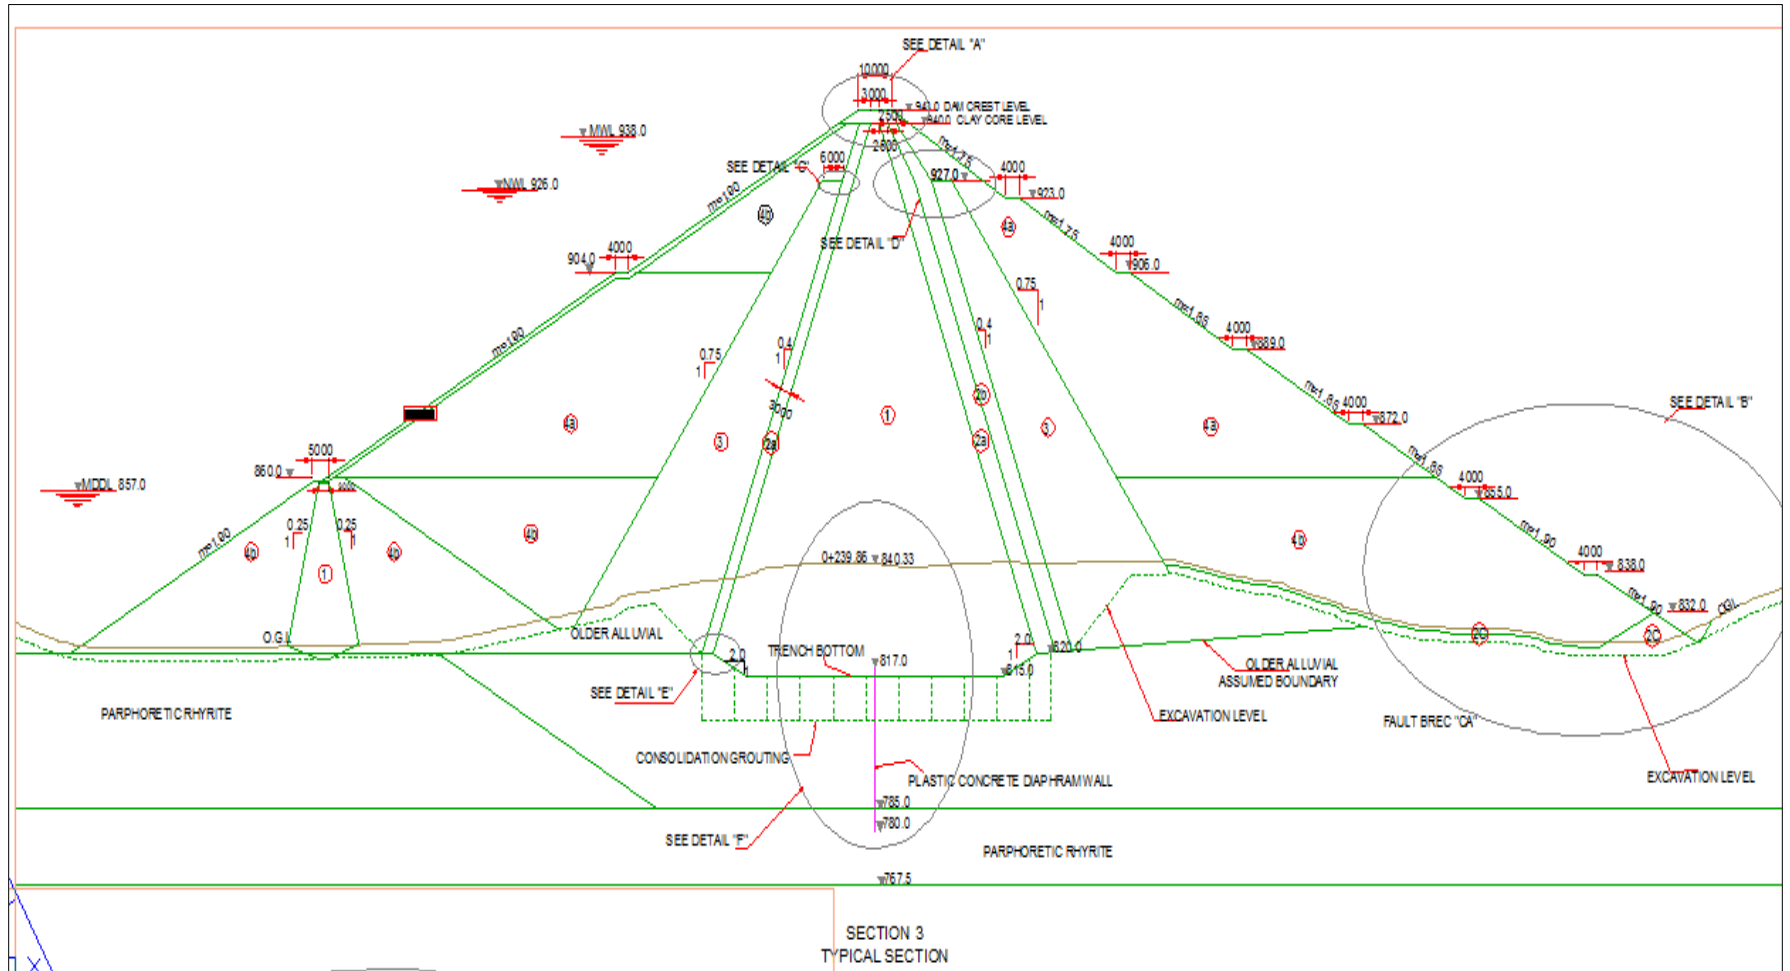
1 Dam Cross Section(Source:WWDSE, Design Report)
